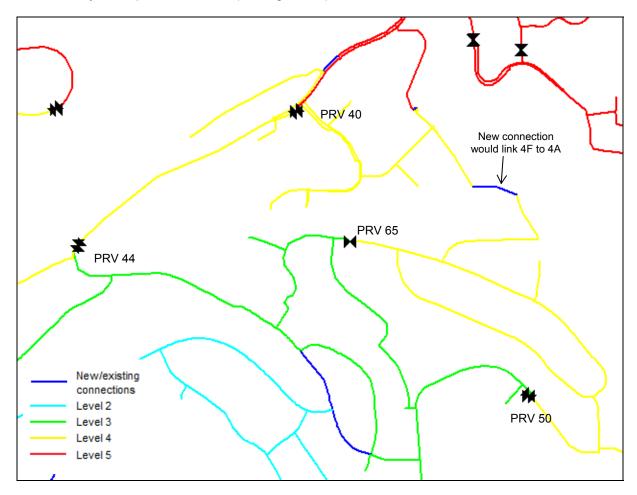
Potential pipe connection between Zone 4F and Zone 4A
